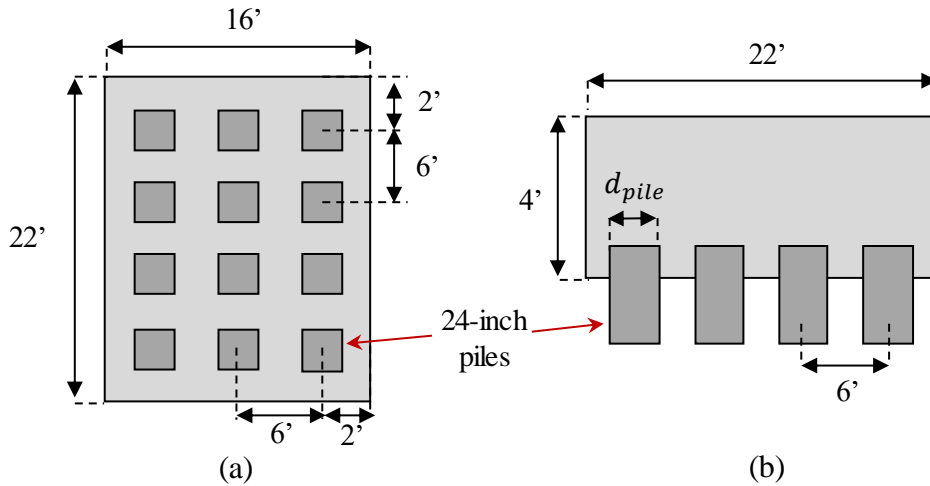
Pile cap details (a) Plan view (b) Cross section
